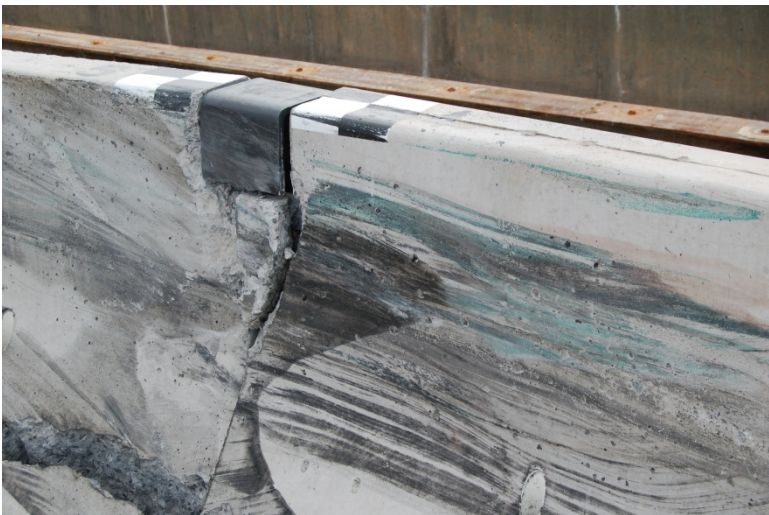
Barrier No. 4 Damage, Test No. NYTCB-5
